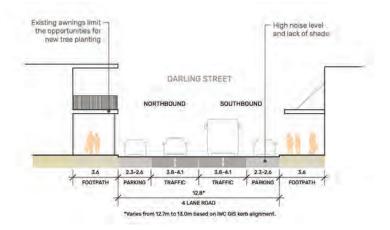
Darling Section (1:200) Typical Existing Configuration
